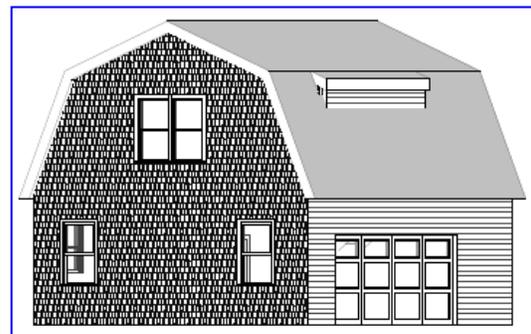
shows what the dormer design would be for a gambrel roof if it meets the requirement of the 2’ setback.
